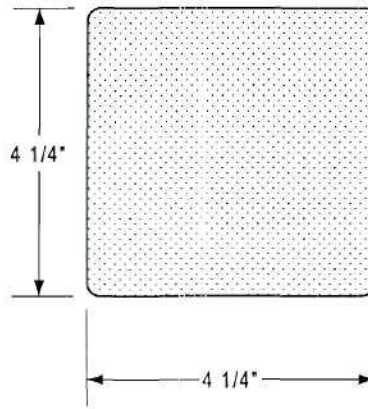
4.25-inch x 4.25-inch small-scale specimen cross section
